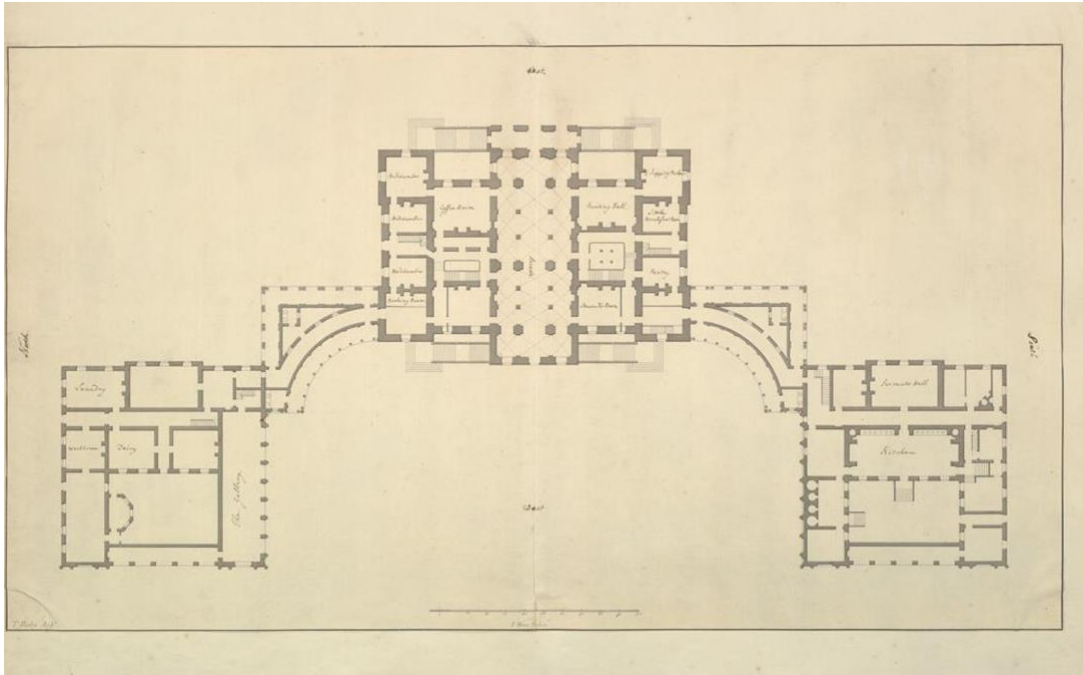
Plan of Houghton Hall, by Isaac Ware 1735. The drawing shows the ground floor. The plan of Houghton Hall showing highly structured architectural space in the eighteenth-century home.
